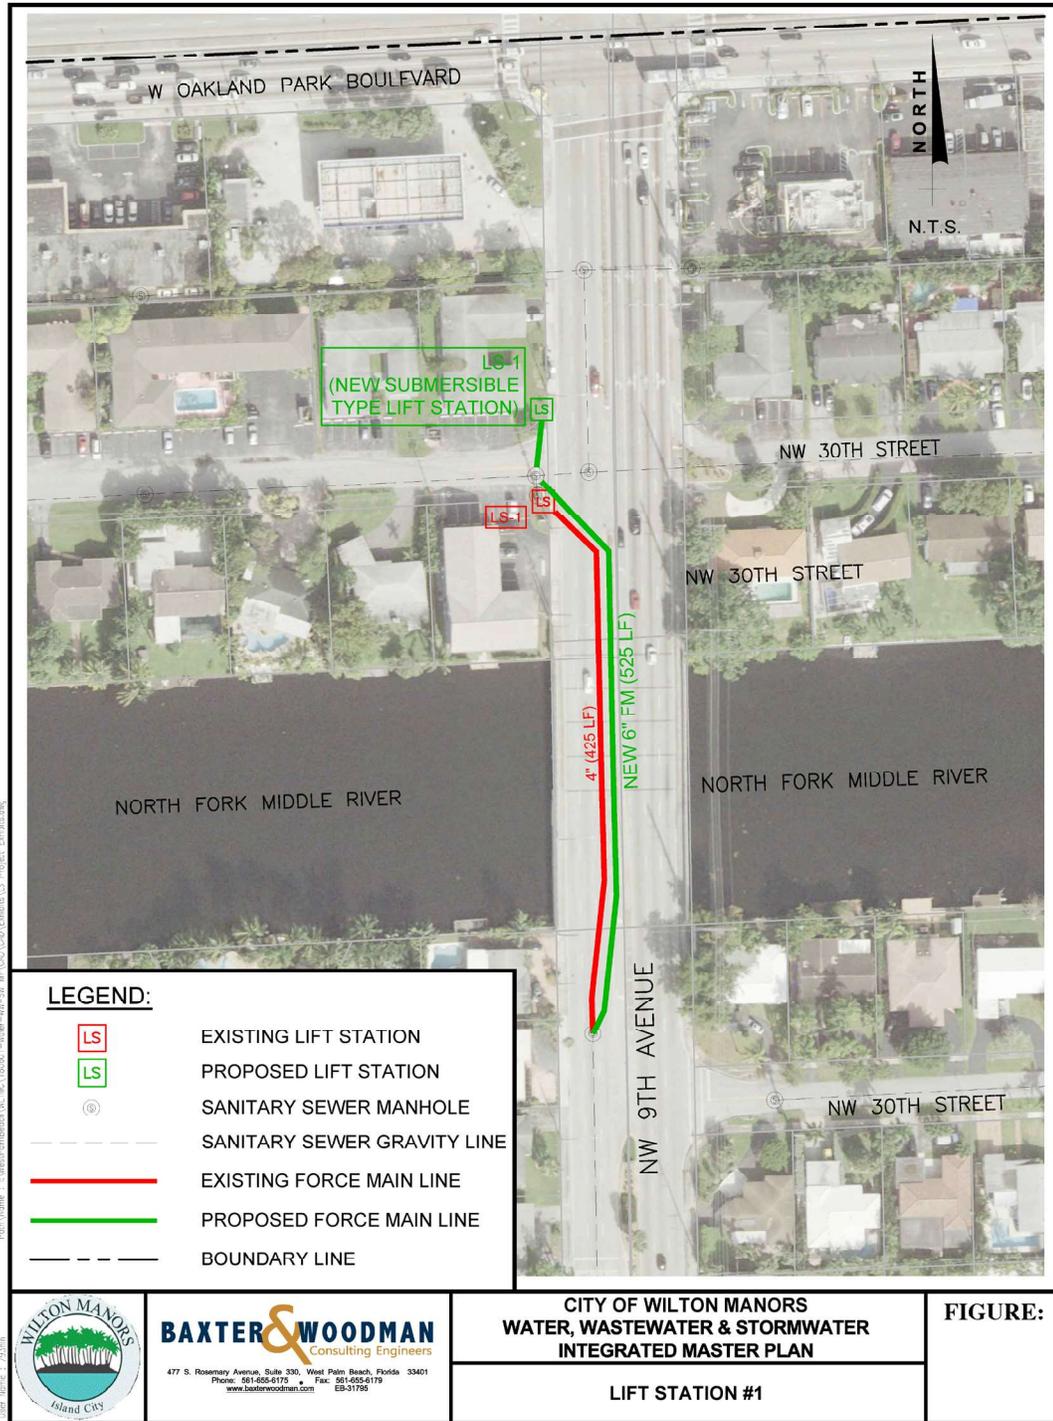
Project #2 – Proposed Lift Station No. 1 Replacement
